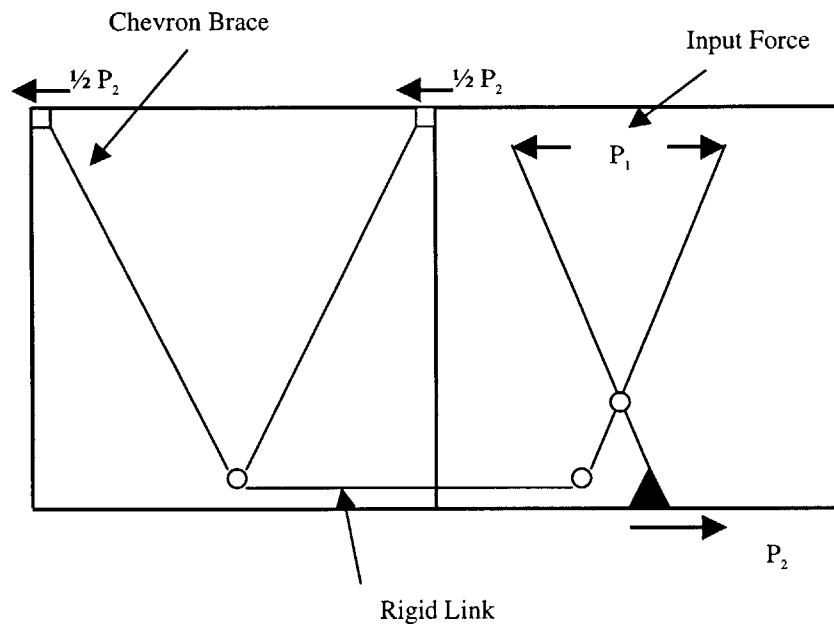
Lever Assemblage Inside Wall Panel (Shear Control)
